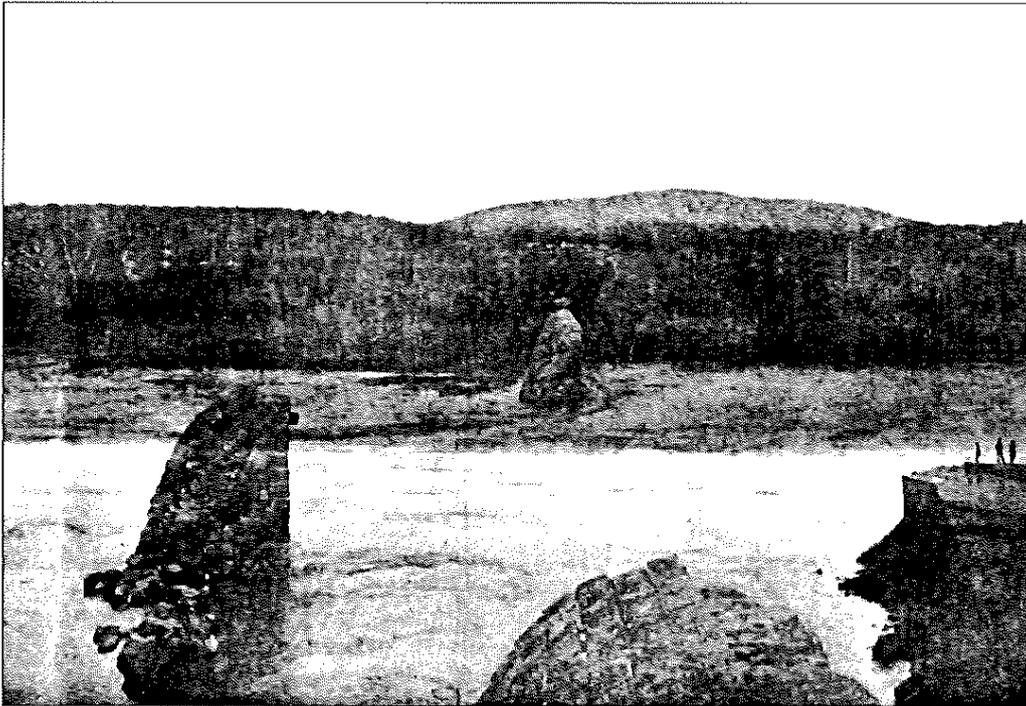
Failure of Austin Dam, TX (after Scientific American, 4-28-1900)
